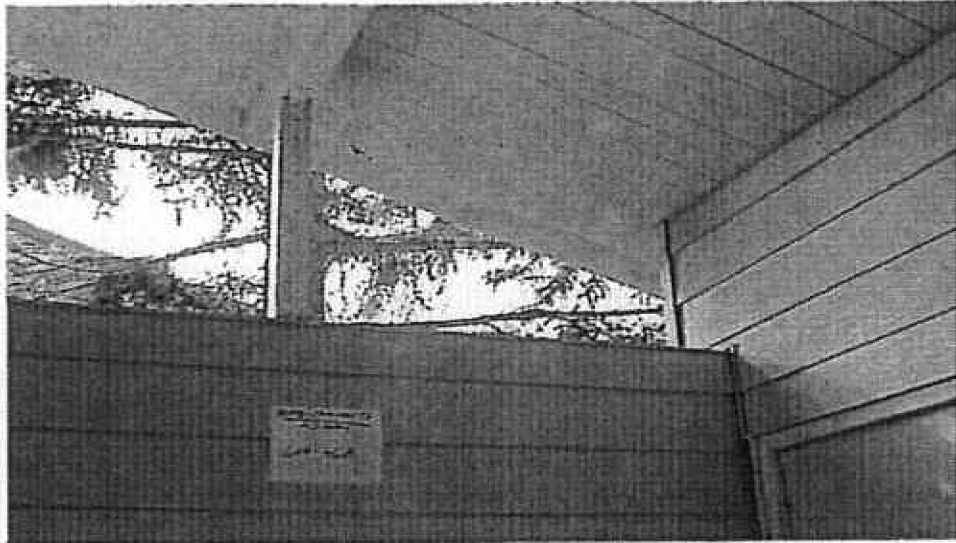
White Wood Soffit and Beams (LHA-46A)
